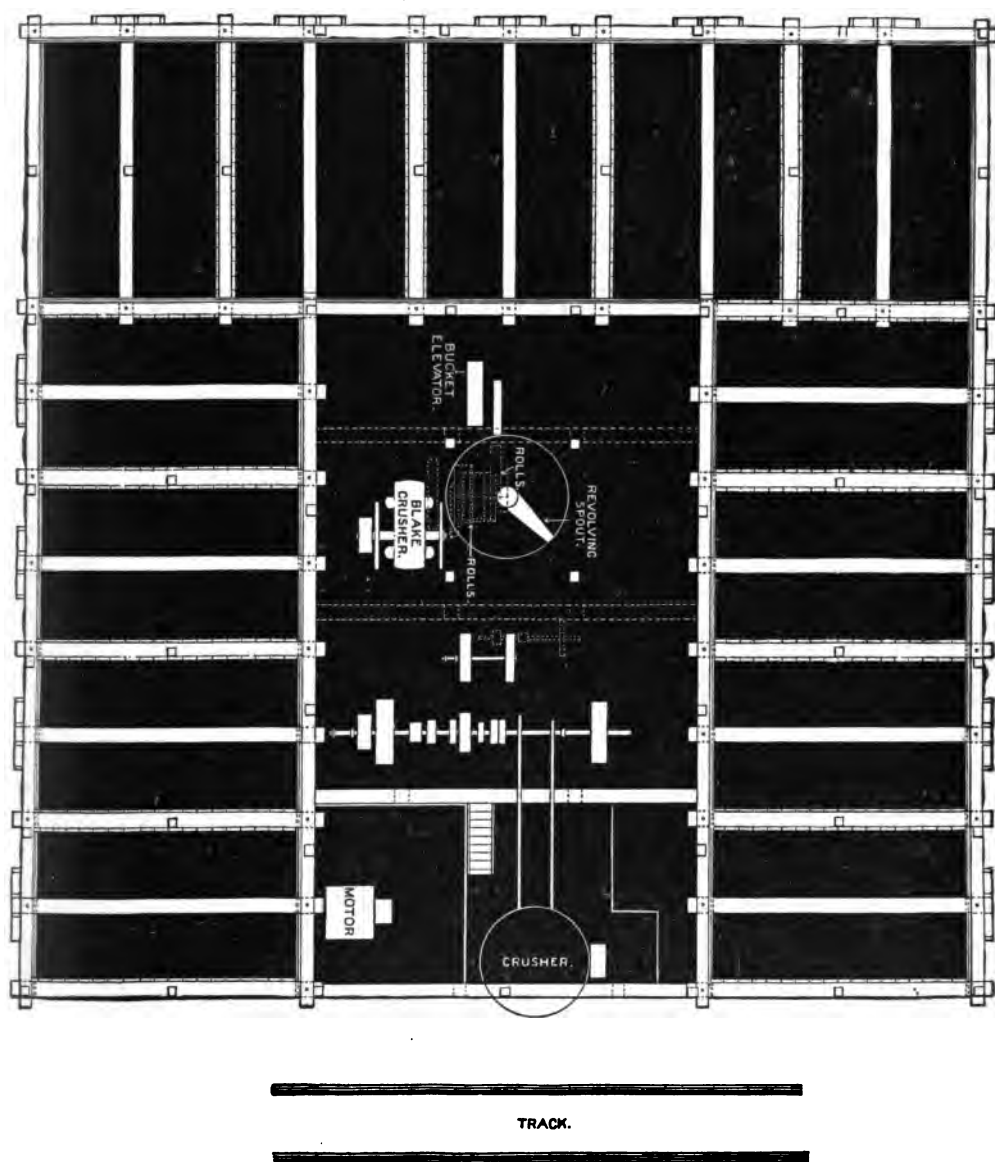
PLAN OF LARGE AUTOMATIC SAMPLING PLANT.
